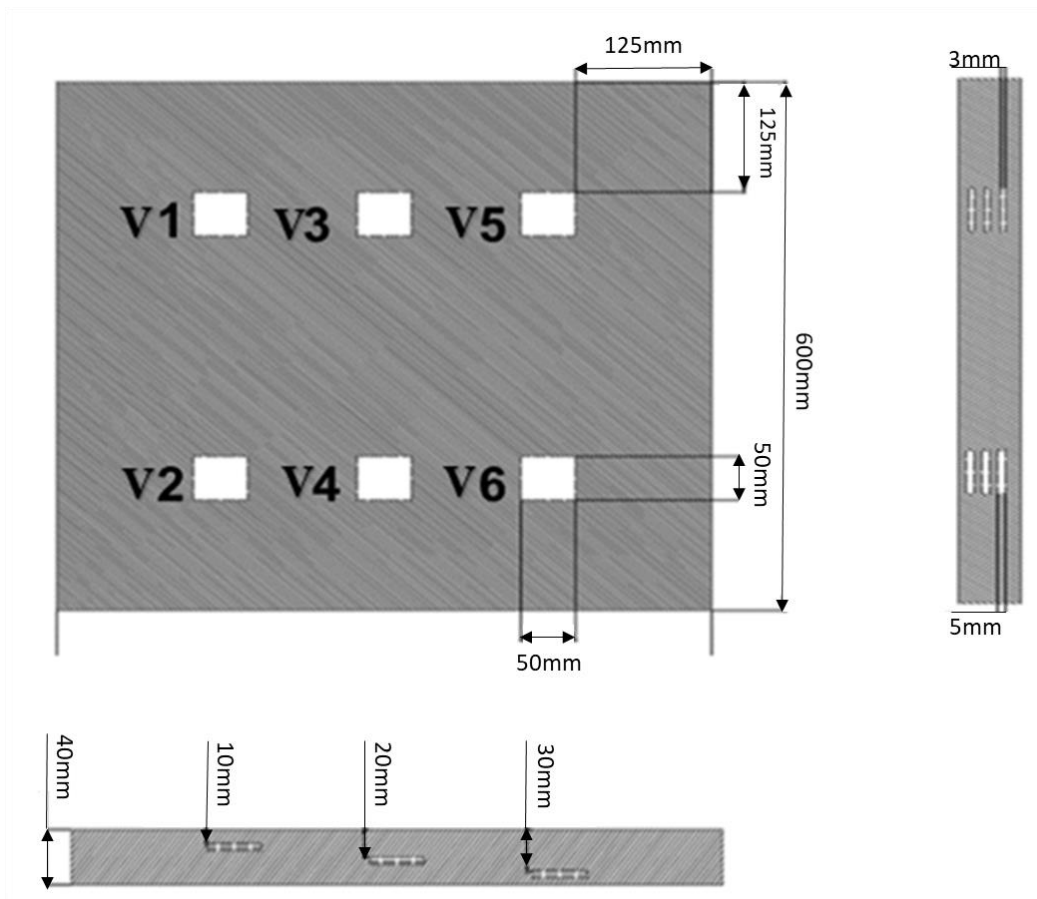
Details of concrete slab (specimen) and all six-voids.
